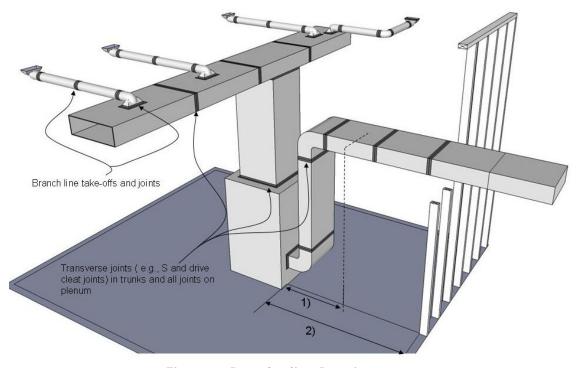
Duct Sealing Requirements Forming Part of 4.6.5.3 (a) ii)
